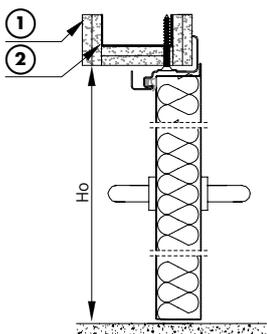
Installation of the single-leaf door with the corner frame in a masonry wall, vertical cross-section
